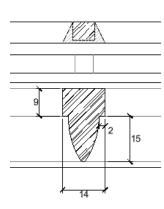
Proposed detail new windows in extension, where thermal values need to be greater to meet current standards. Painted timber astragal, planted on new double glazing to ensure profile matches the existing.
